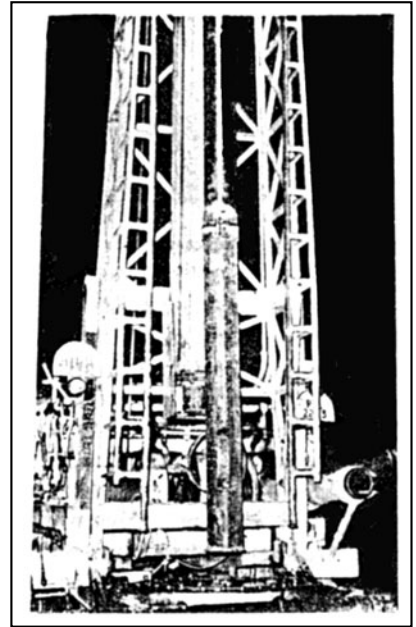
Lowering of well screen and casing pipes in a bore drilled with a reverse rotary drilling rig
